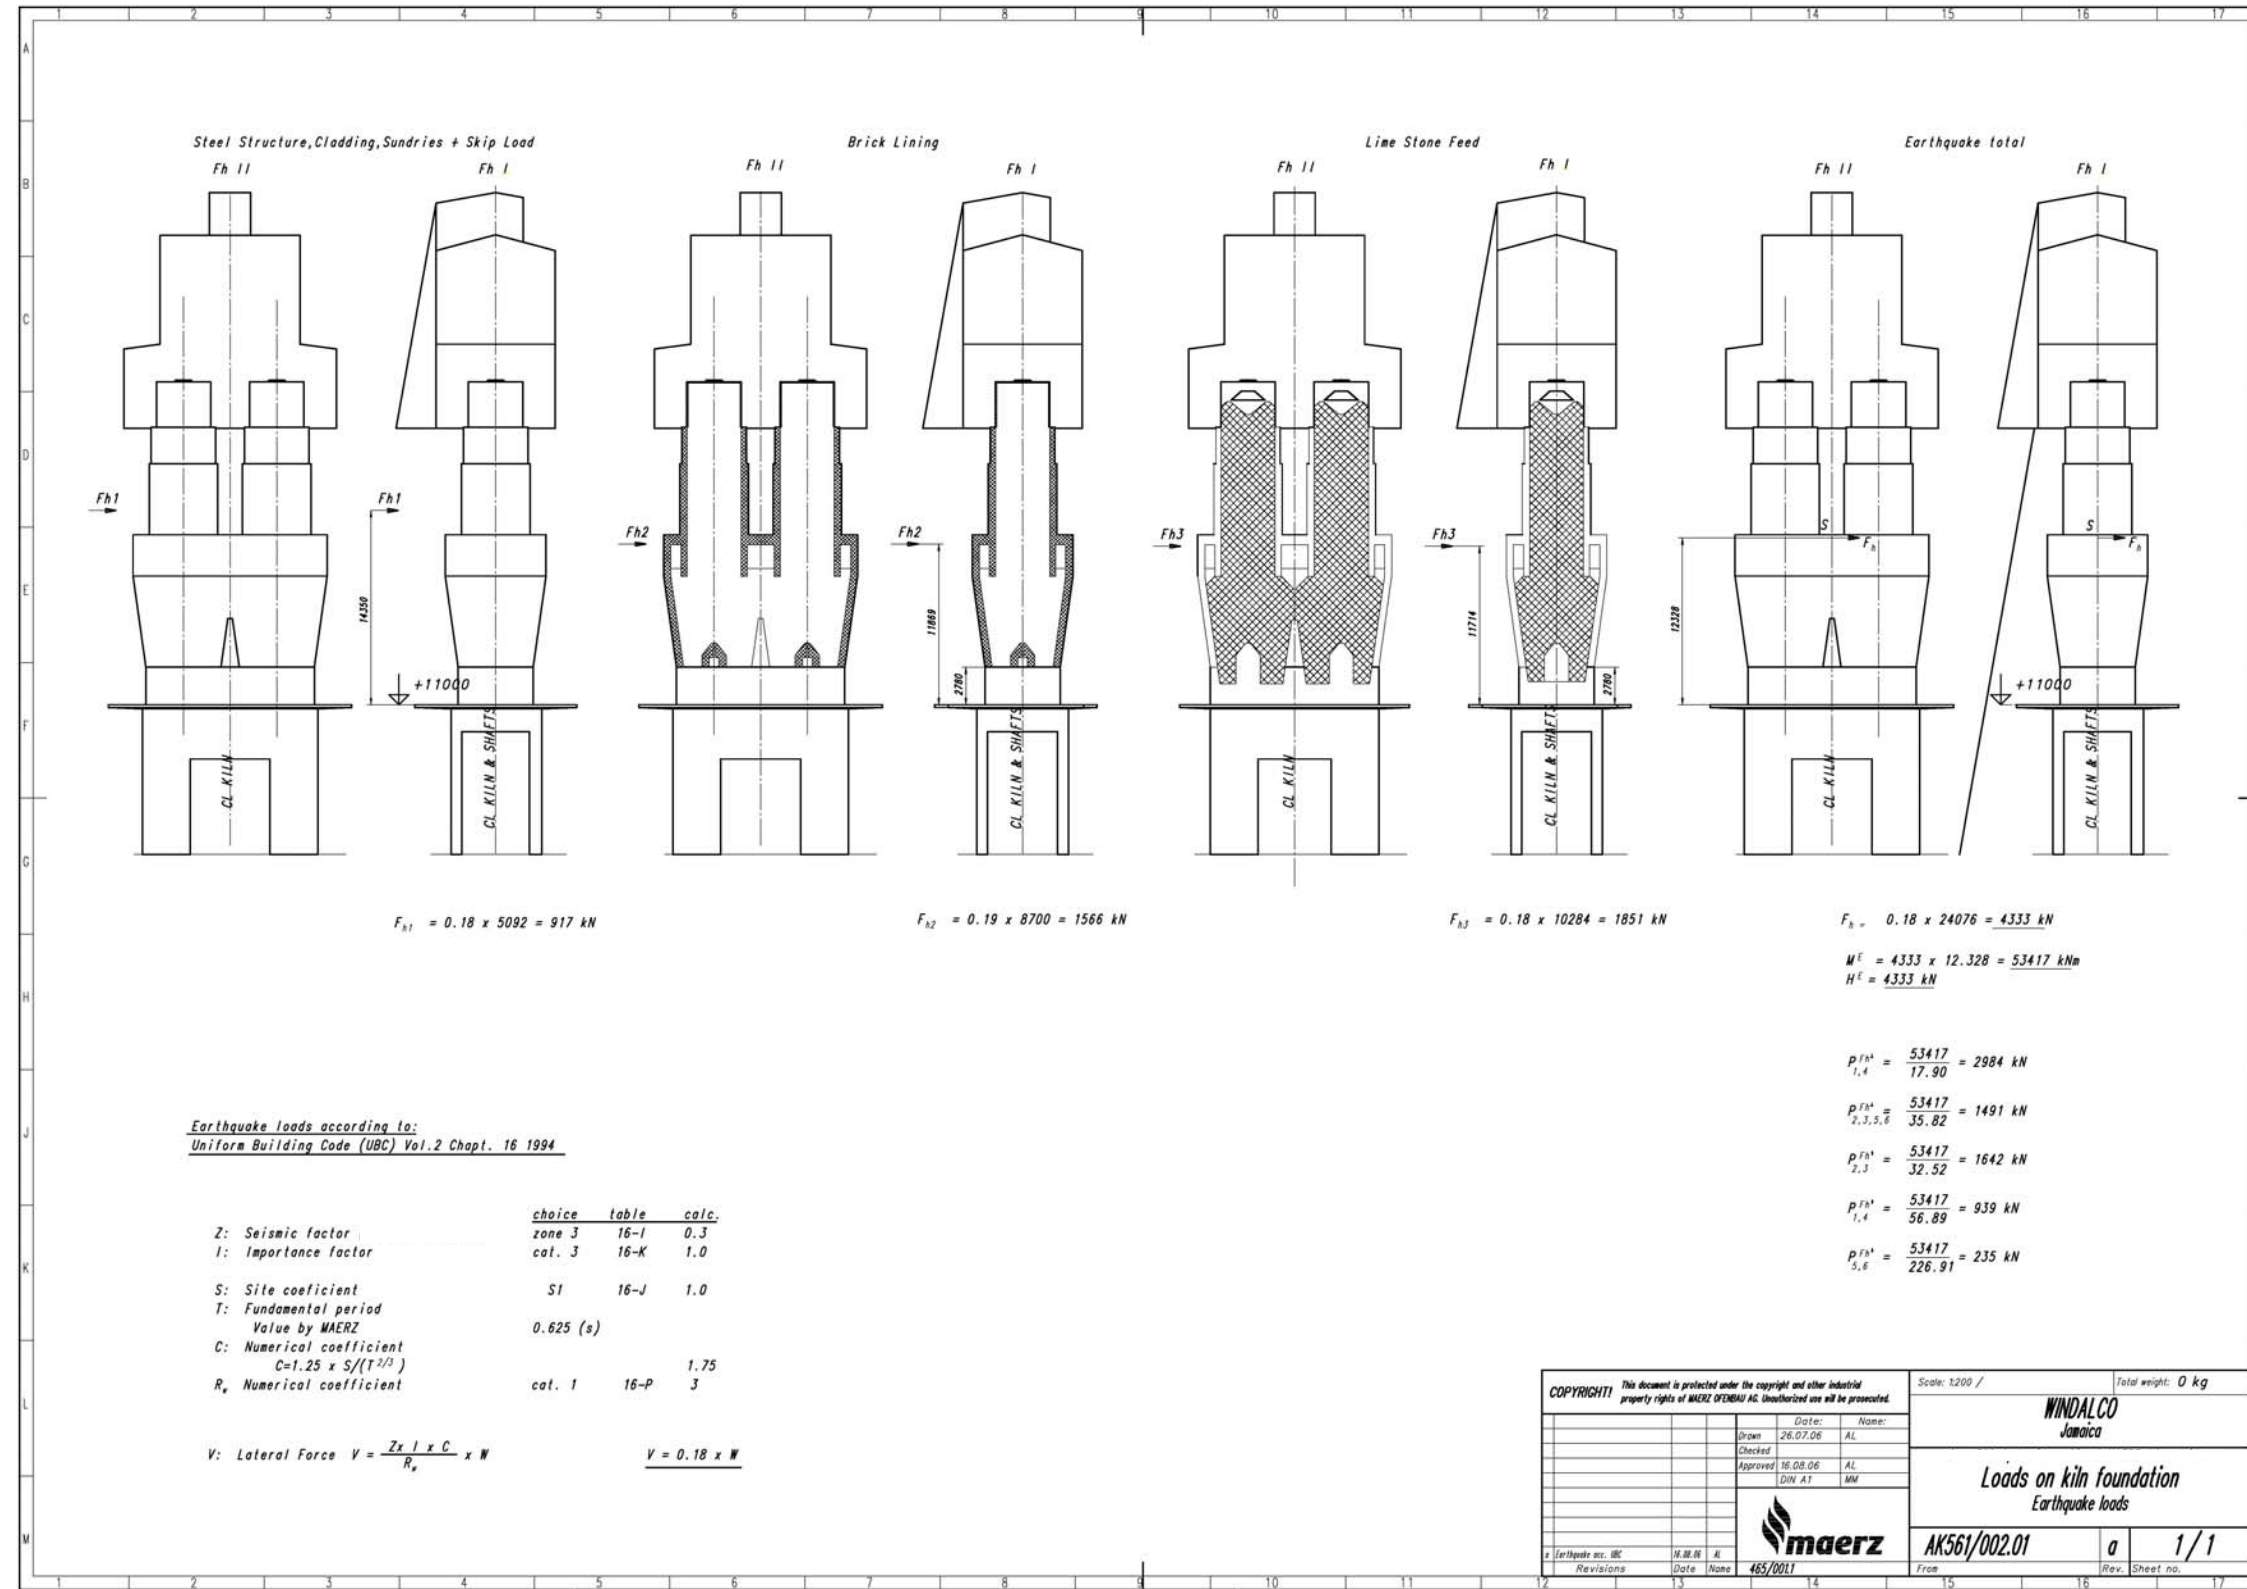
Loads on Kiln Foundation – Earthquake loads
